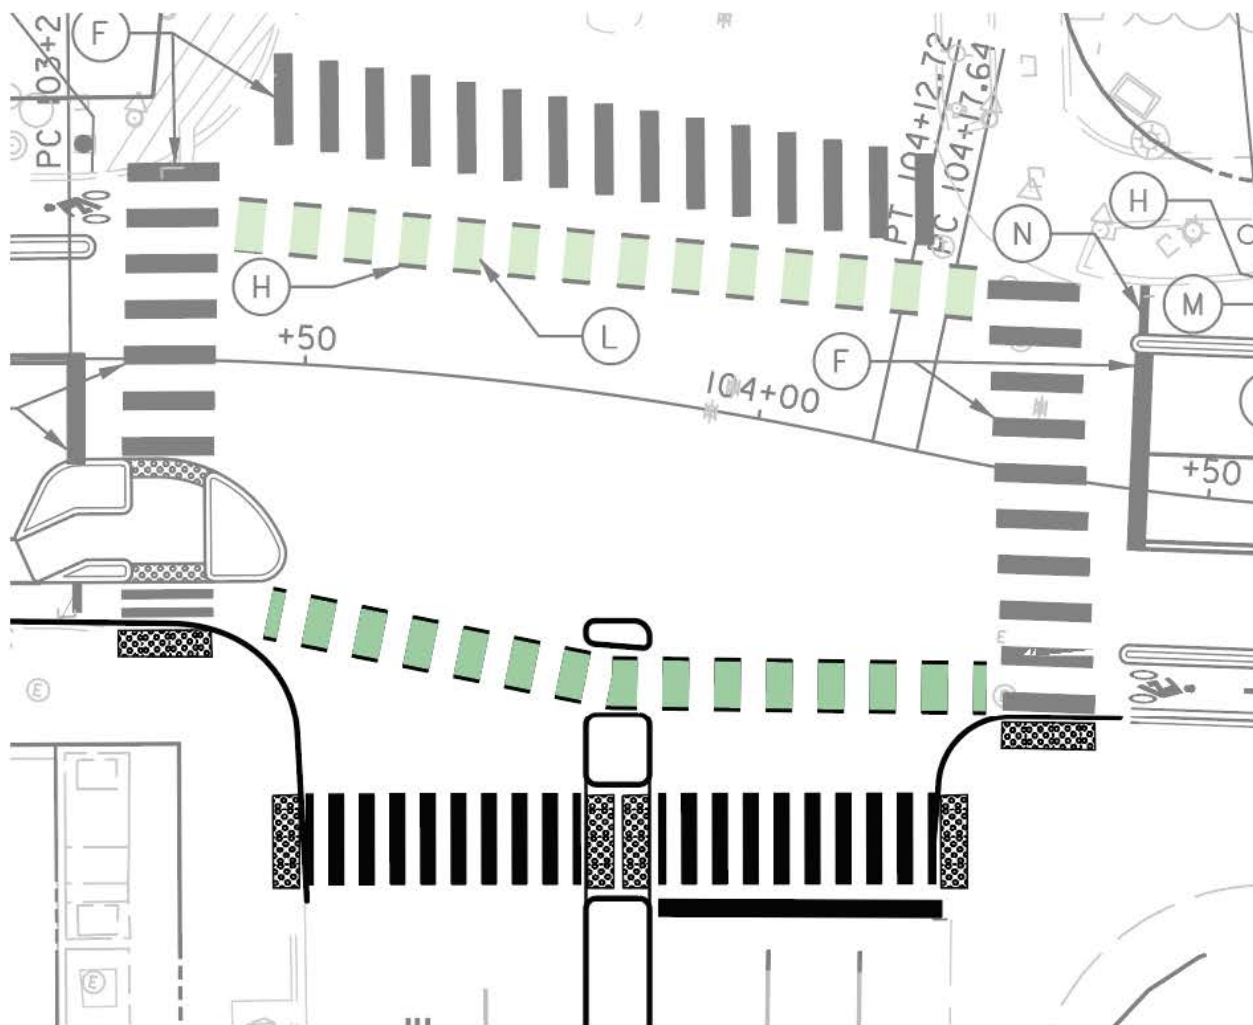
Potential Curb and Crosswalk Changes at Cheltenham Drive/Wisconsin Avenue Intersection
